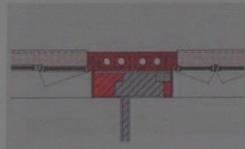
Horizontal section of façade element with integrated ventilation ducts
